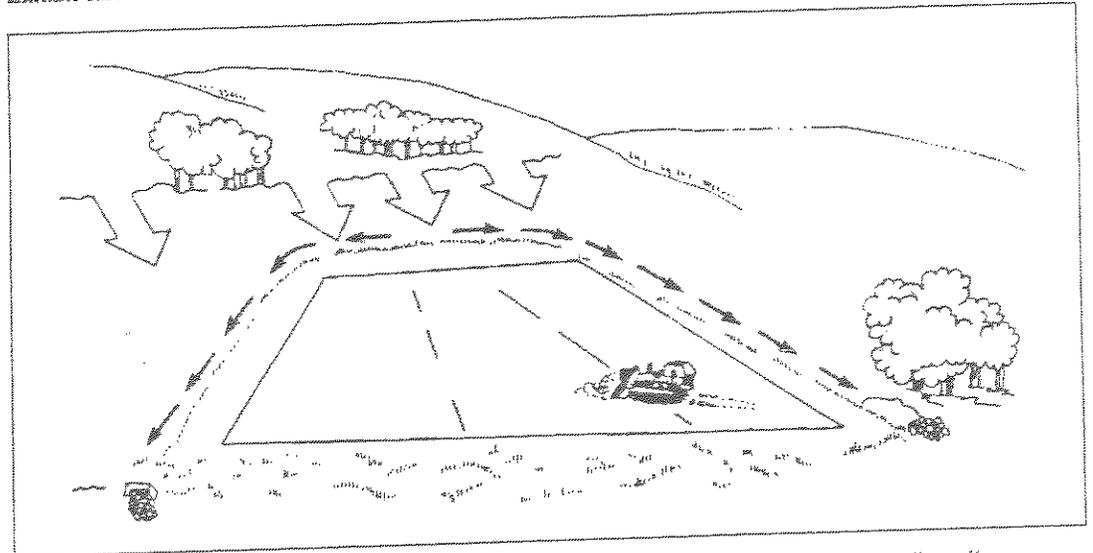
B. A perimeter dike can also prevent surface runoff from entering the construction site.
